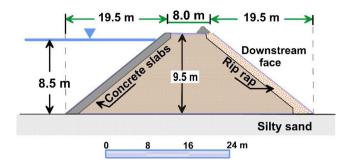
Detailed cross-section of the Umm al Khair dam showing dam body dimensions, crest width, freeboard, and protective layers (upstream concrete slabs and downstream rip rap).
